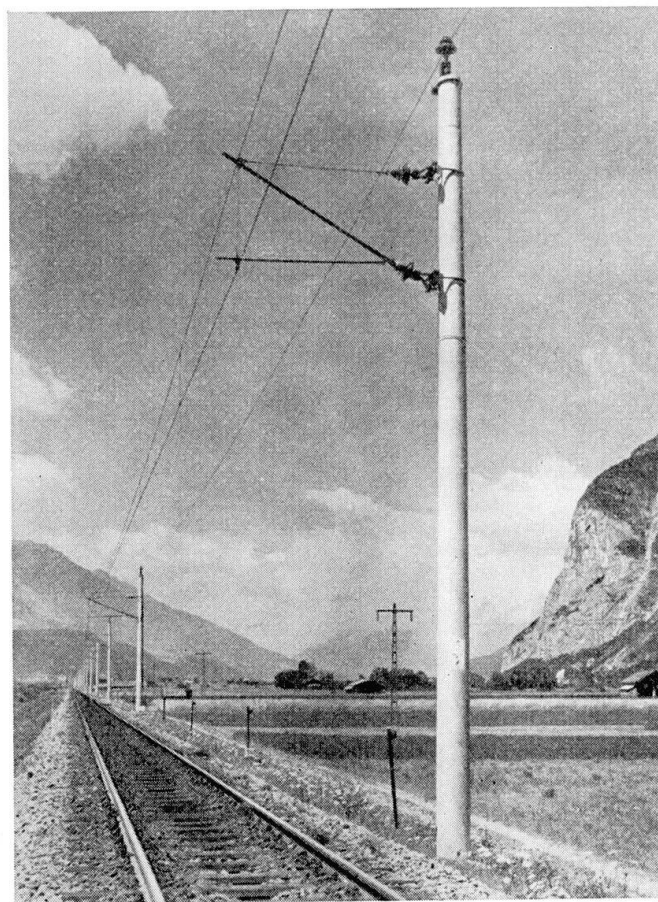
Spun Concrete Cantilever Masts near Innsbruck (Austria).
